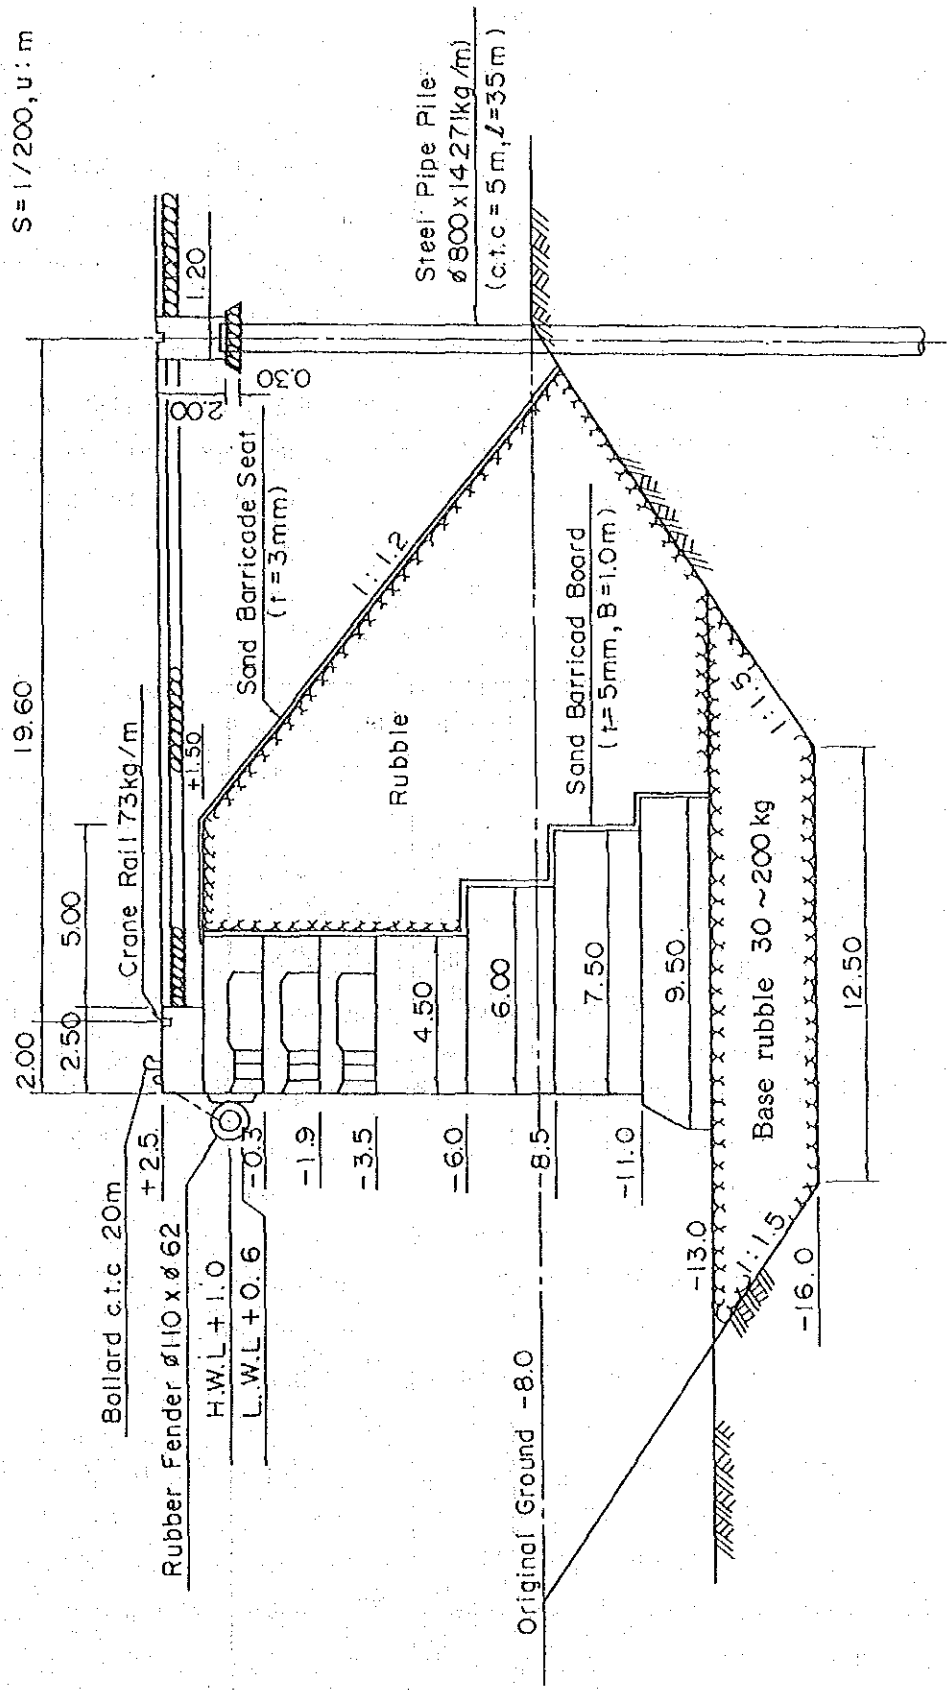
Typical Section of Concrete Block Type Quay
